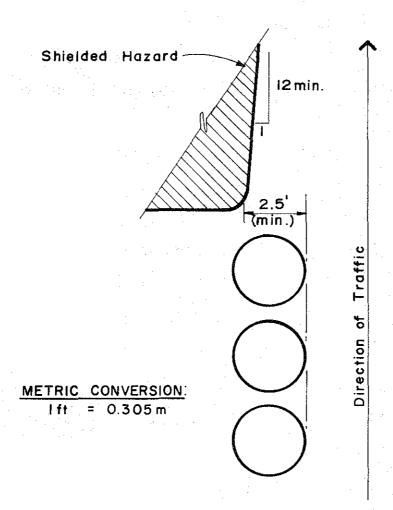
Suggested Layout for Last Three Exterior Modules in an Internal Barrier
